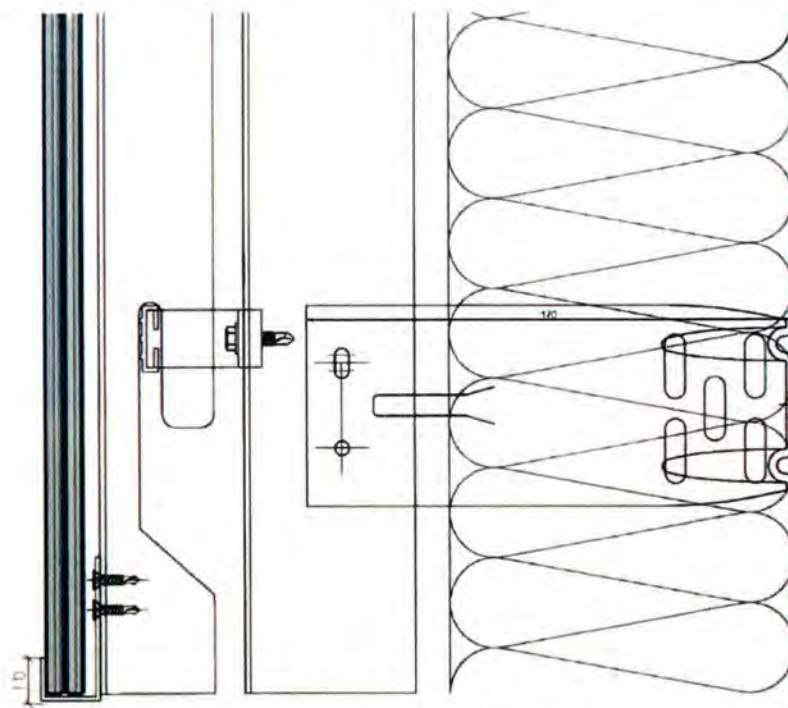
Details of test elements - details of suspension for frameless photovoltaic modules to the steel structure with anti-corrosion ZM coating
